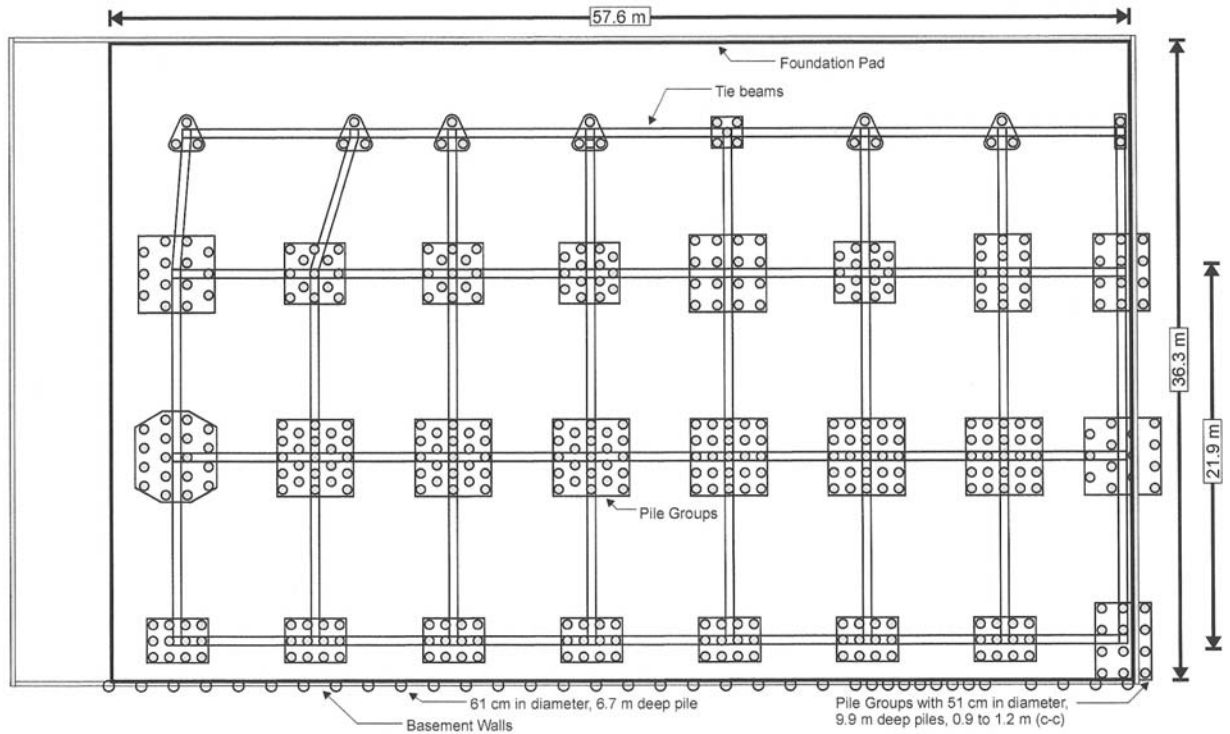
Sherman Oaks building foundation plan, based on construction drawings. 1 ft = 0.3048 m
